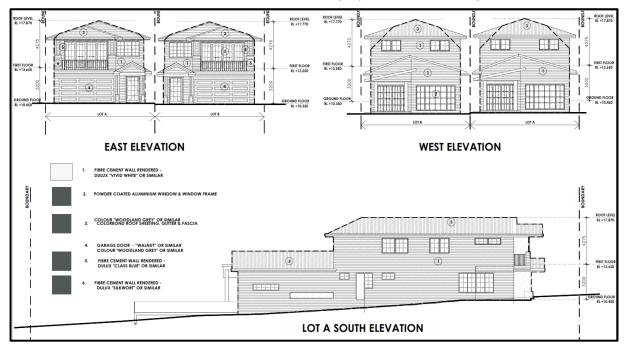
East and West Elevation Plans (Lot A & B) and South Elevation (Lot A)
